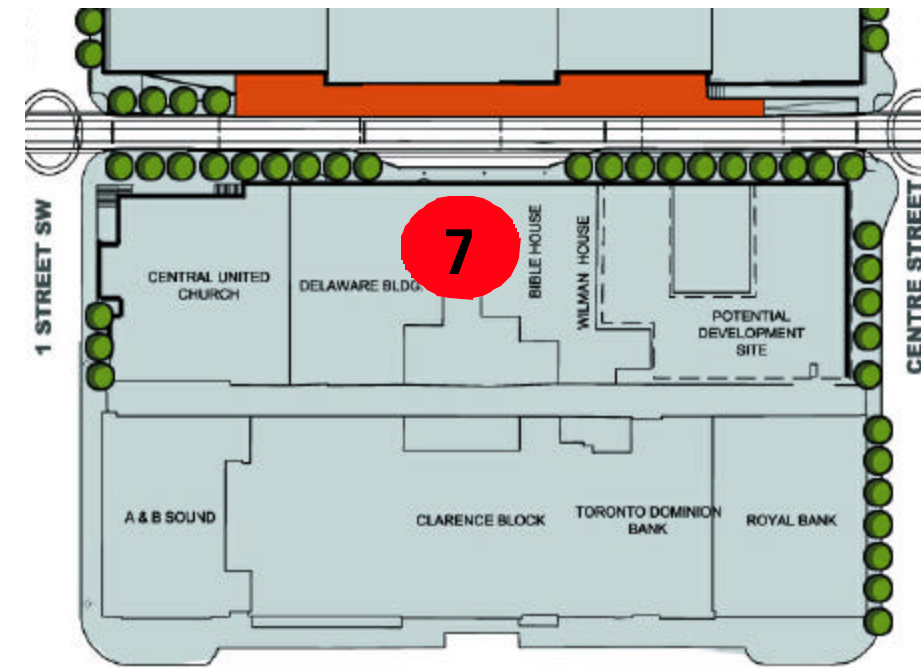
, Site 7 on the south side of 7th Avenue between 1st Street West and Centre Street (Block K)
